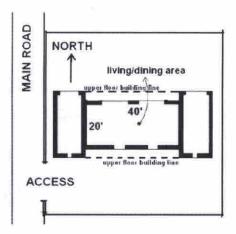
Simulated elevation and site plan of PA Case showing elongated form.
